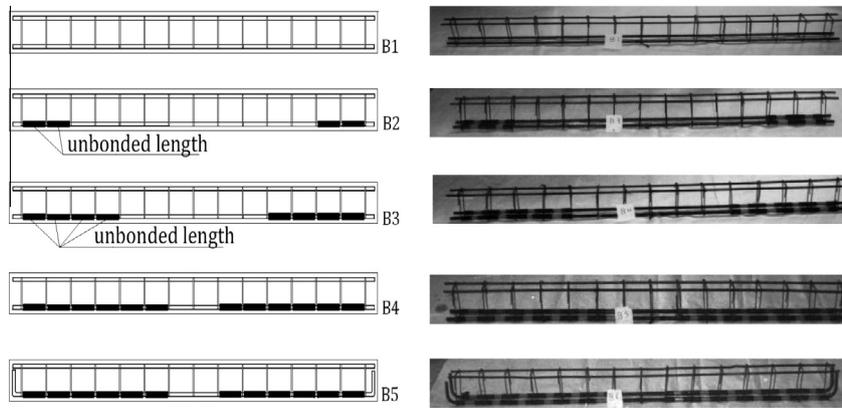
Pictures showing the details of the un-bonded zones for different beams.
